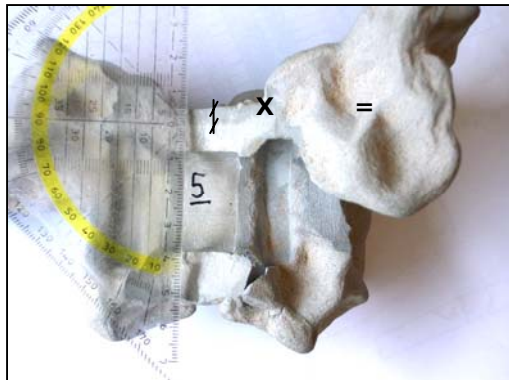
Test 5, bleeding layer x (the total fracture of test 5 is shown)
